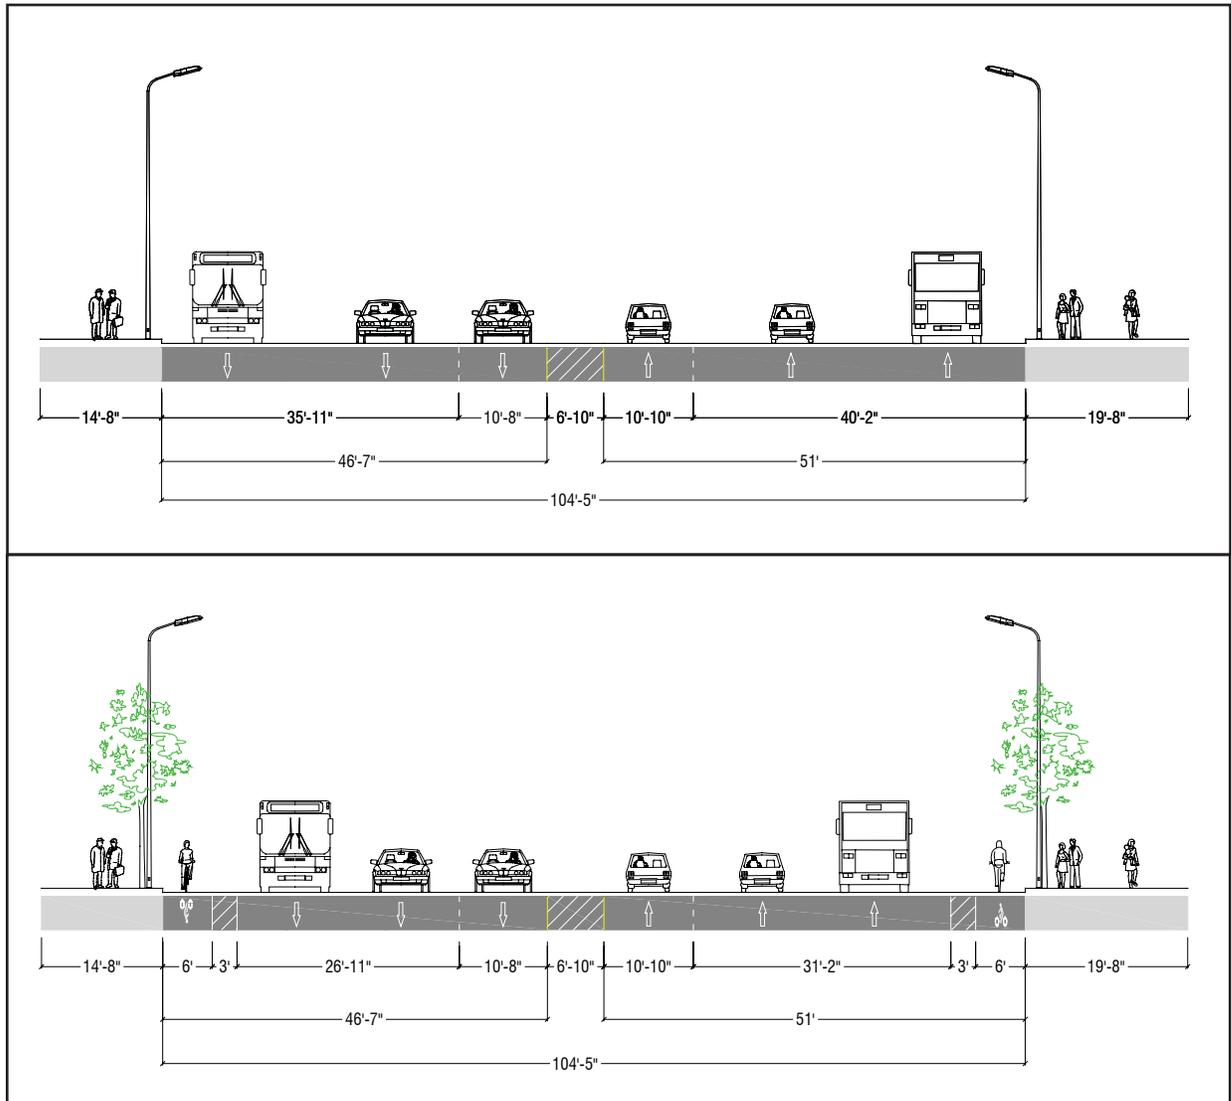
East 138<sup>th</sup> Street between Walton Avenue and Park Avenue, existing and recommended cross section (facing west)
